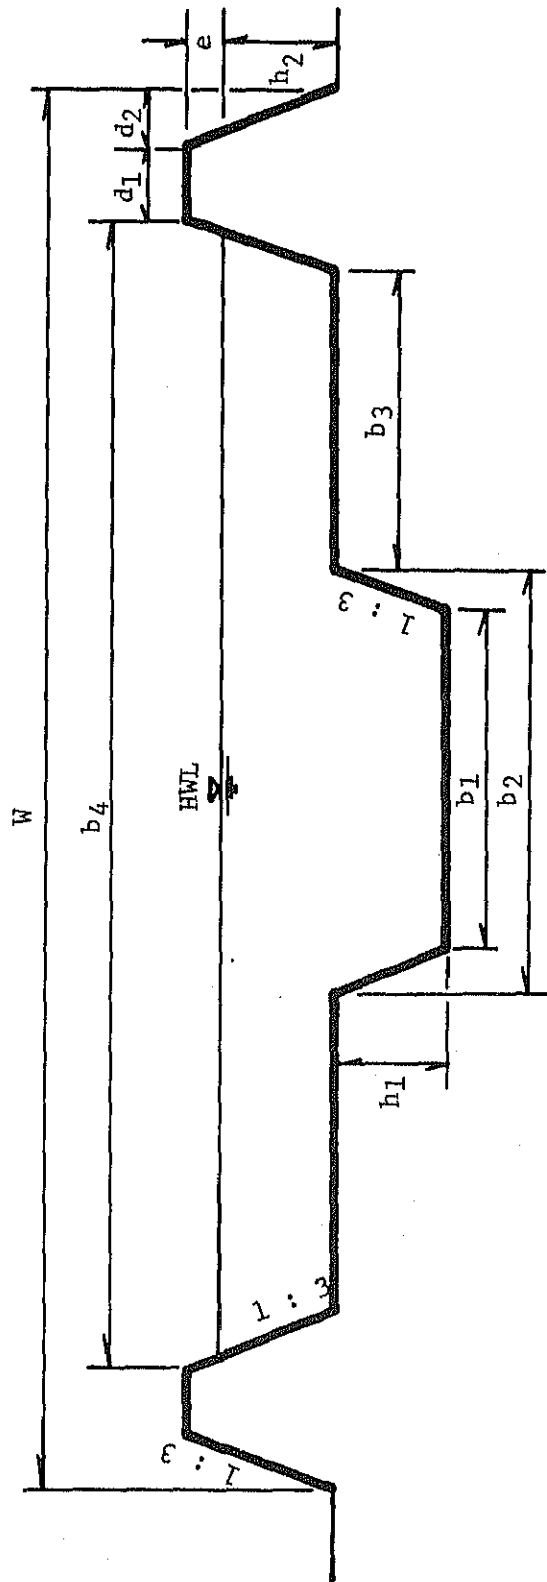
STANDARD CROSS-SECTION OF PLANNED WEST DIVERSION CHANNEL (PLAN-2)
